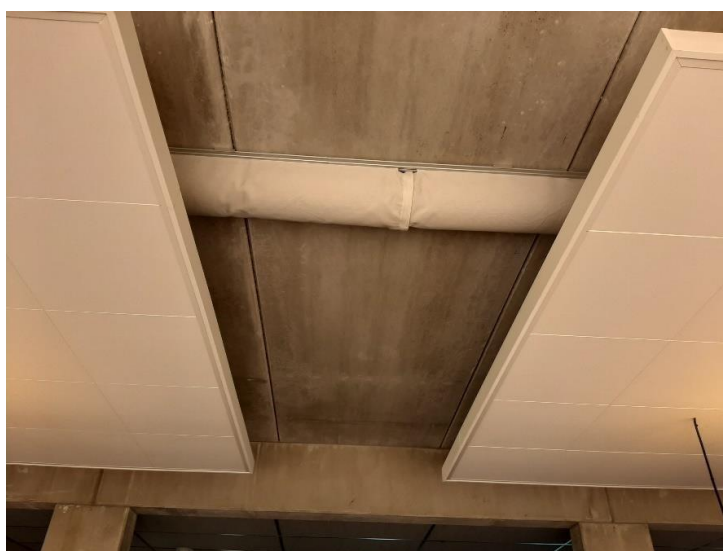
Noise damping return air plates; ceiling of double high library.
